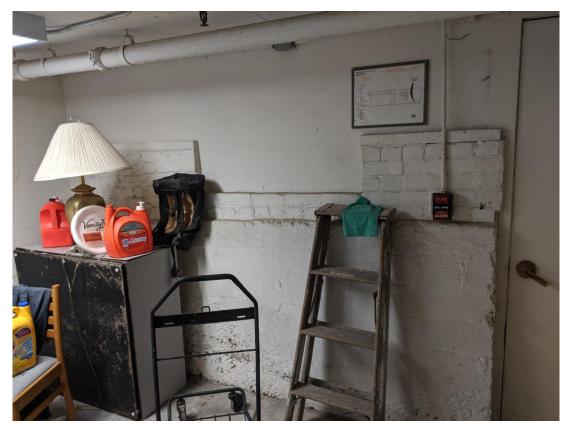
Area of Brick Wall Over Concrete Stem Wall in Basement
